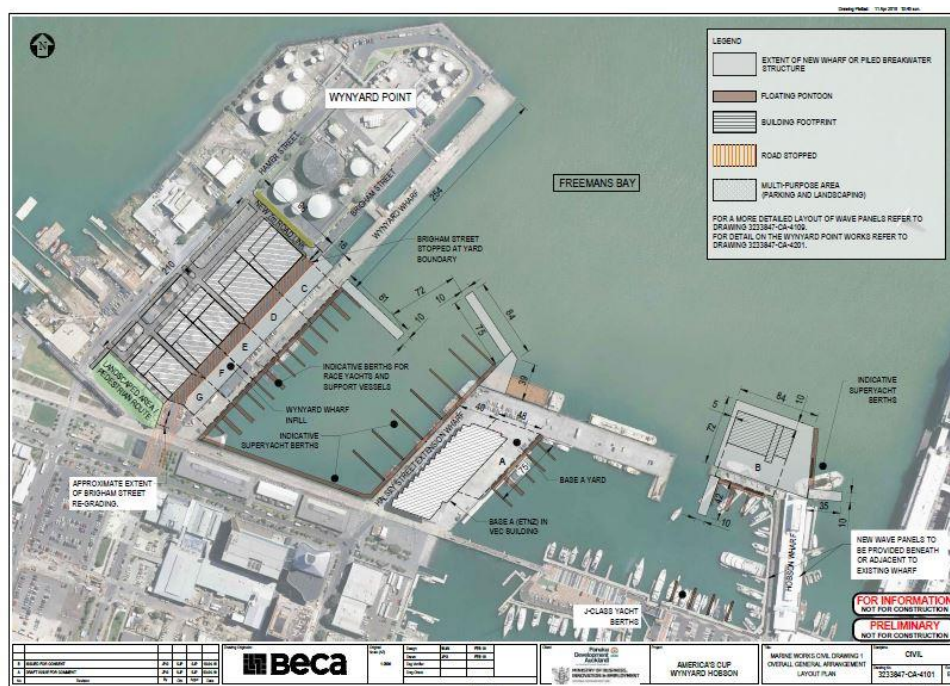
Proposed General Layout Arrangement taken from AEE
